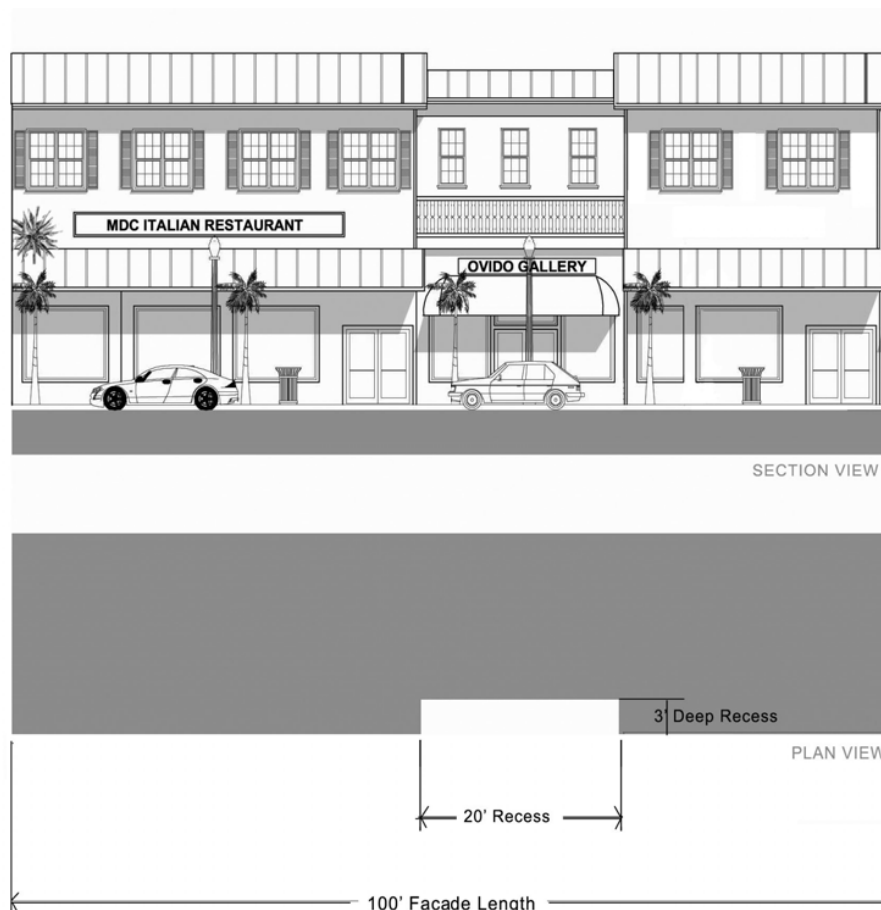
Example of Building Mass Facade and Elevations
